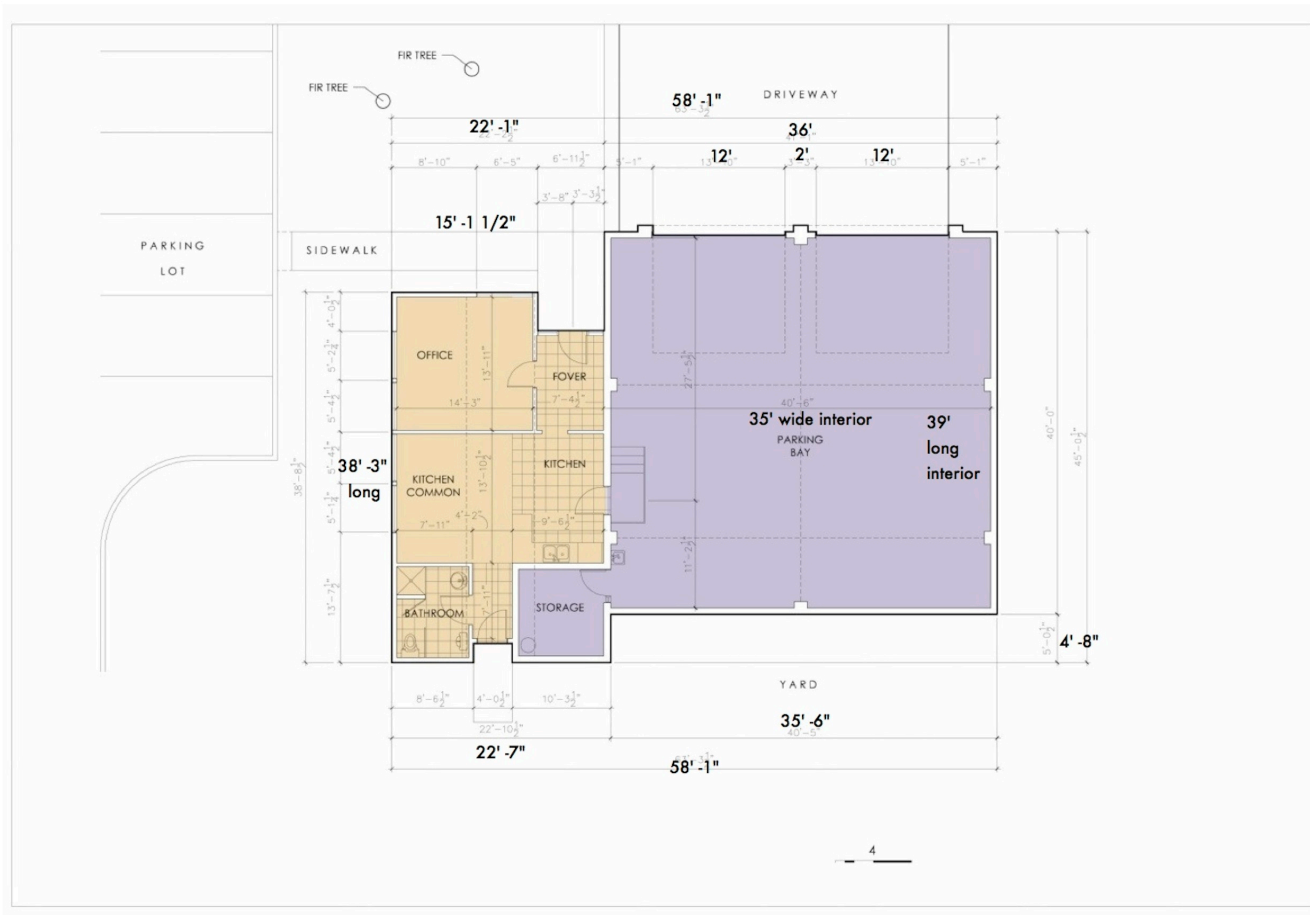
Plan of the existing Station Building 1 in 2010. Dimensions corrected 2013
